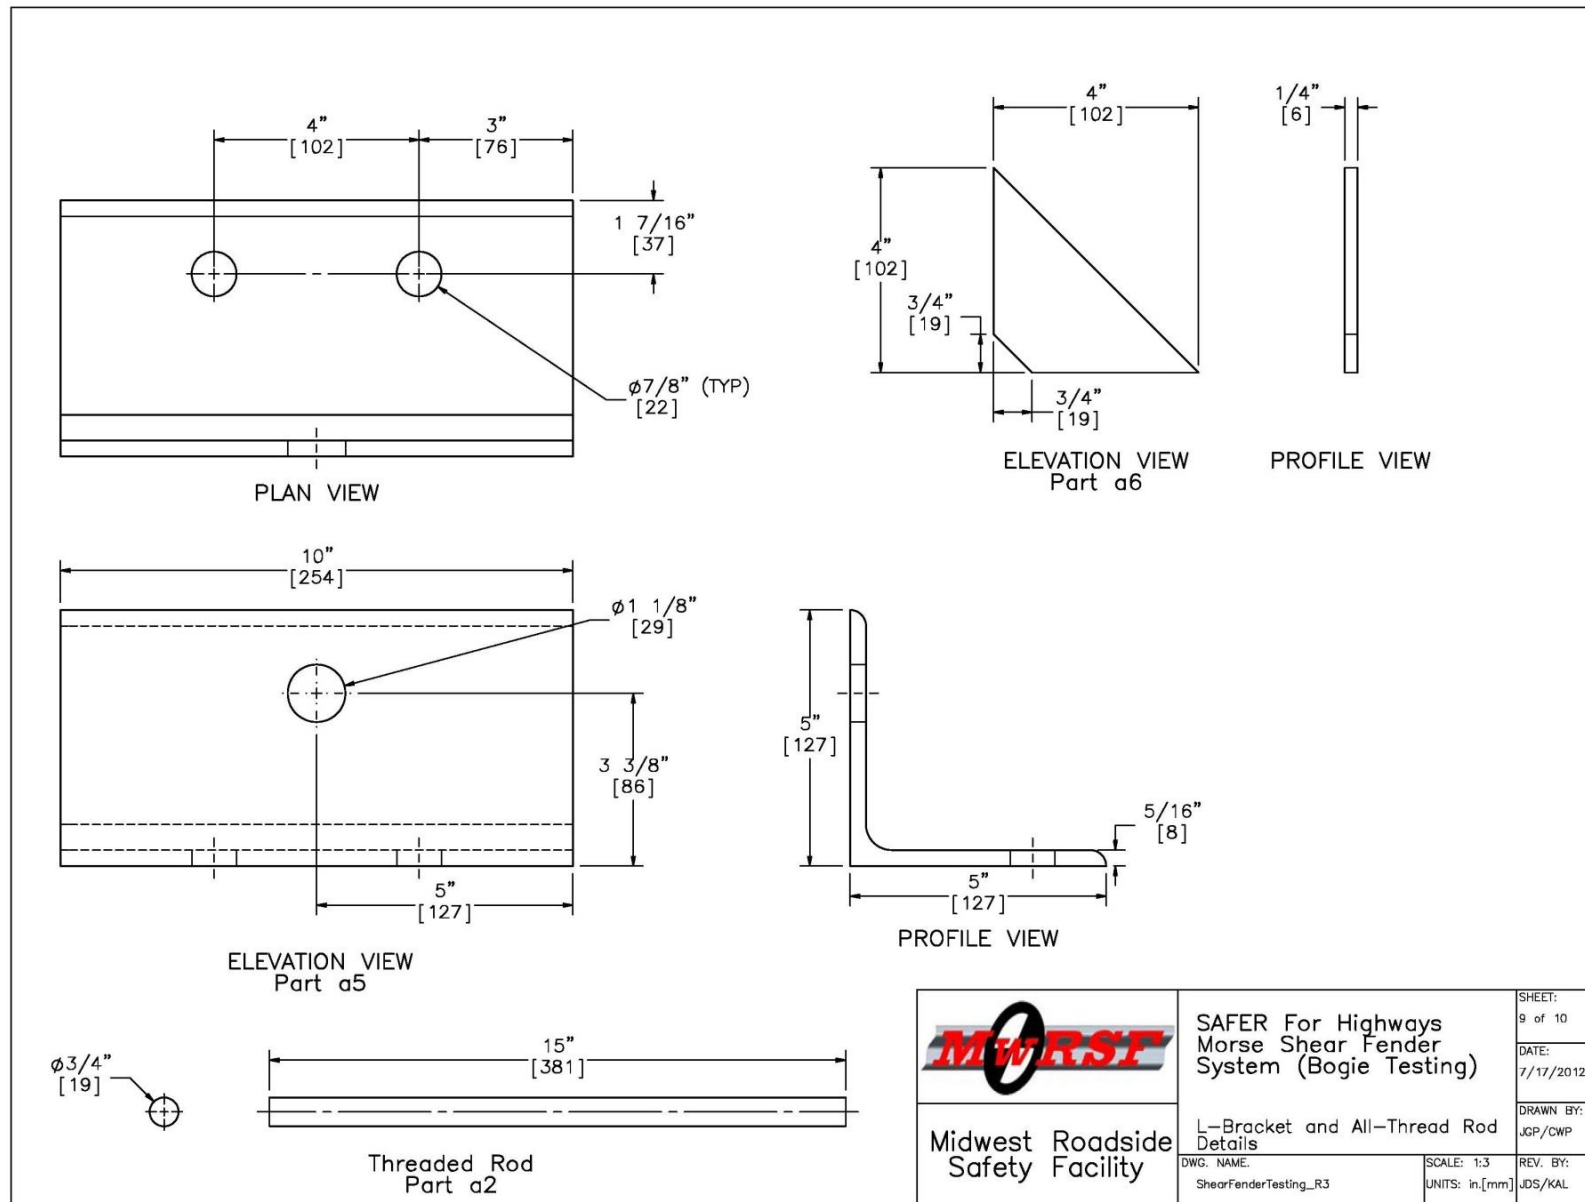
L-Bracket and Threaded Rod Details, Test No. SFHT-1
